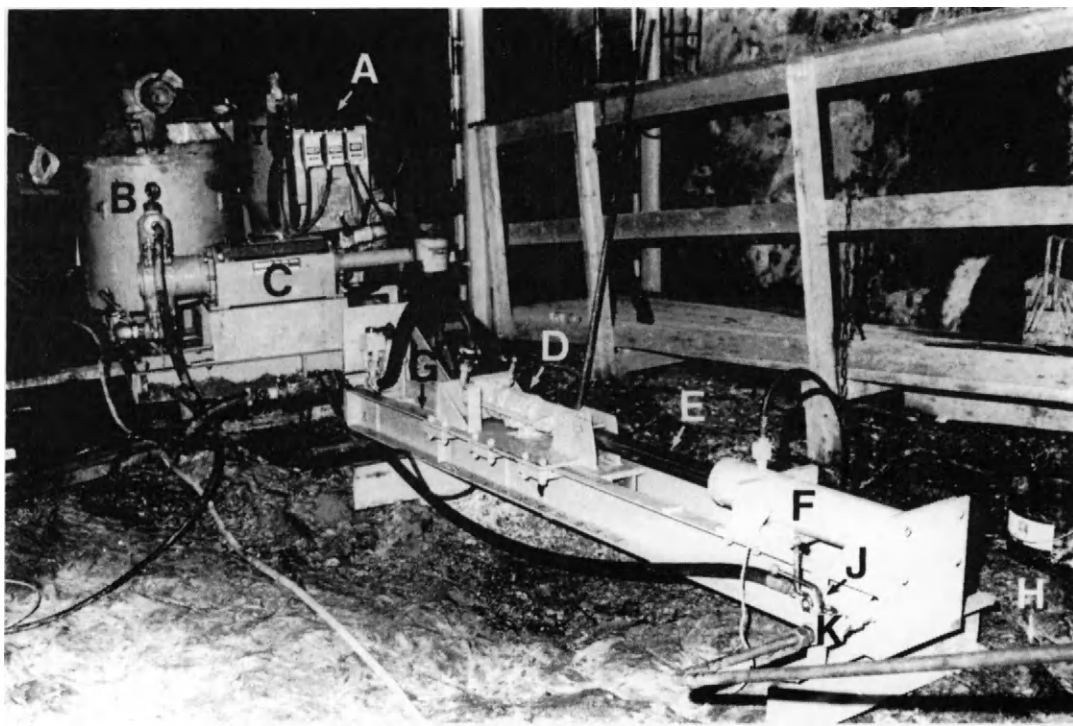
Prototype machine for injection of large boreholes at Stripa [12]. A) Colloidal mixer, B) Stirrer, C) Plunger pump, D) Oscillatory pressuring device, E) Piston acting on the grout in cylinder F, J) and K) are valves
